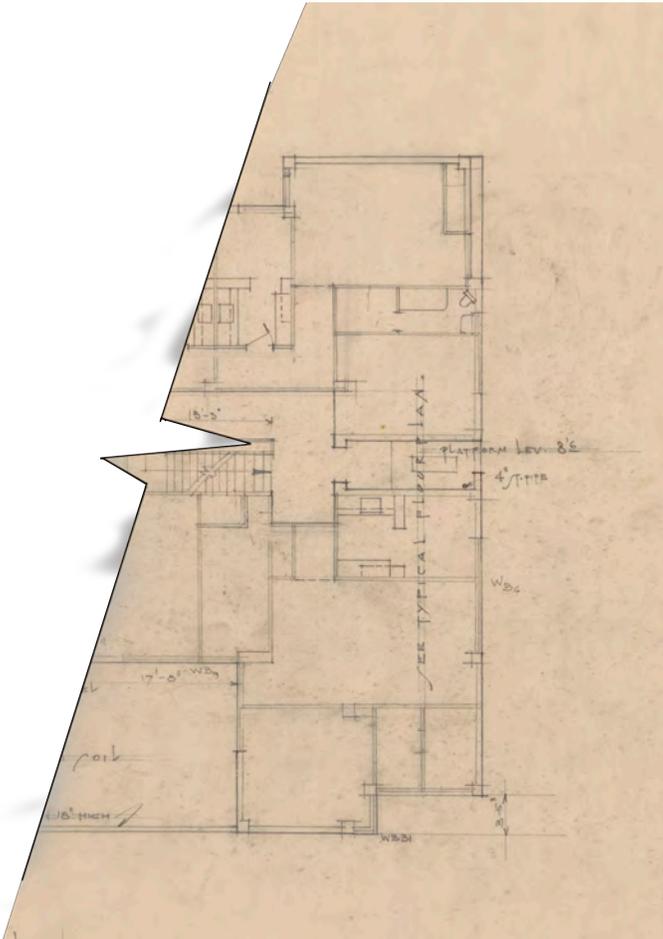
Clip of Original Floor Plan (schematic sketch) showing units on west side of the building.
